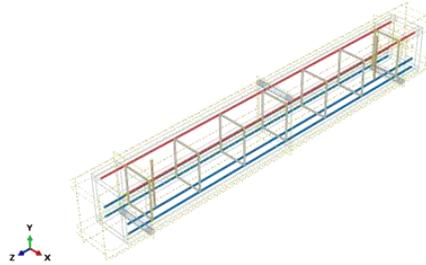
Reinforced concrete for strengthening beam with 2 CFRP (B200-E10-V)
